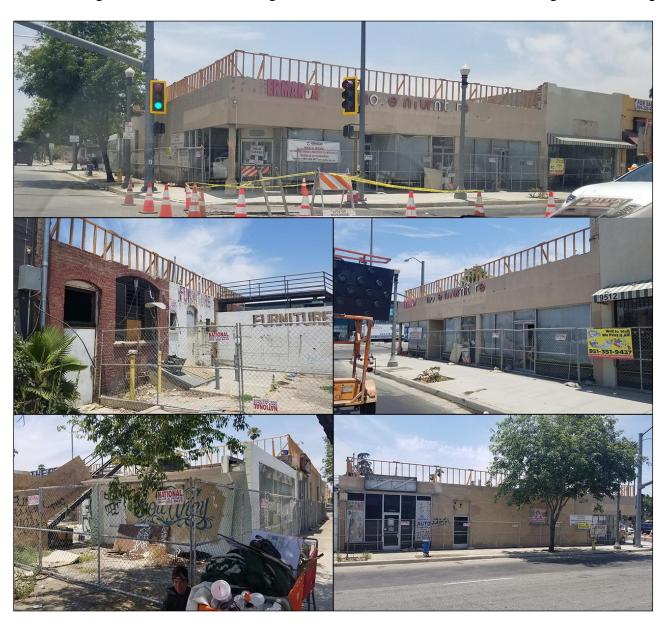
Post-fire condition of the Jensen Building. *Clockwise from top*: overview of both street-facing facades, to the southwest; Magnolia Avenue façade, view to the southeast; Van Buren Boulevard façade, view to the west; rear addition to the building, view to the north; rear façade, view to the northeast. (Photographs taken on June 15, 2021)
